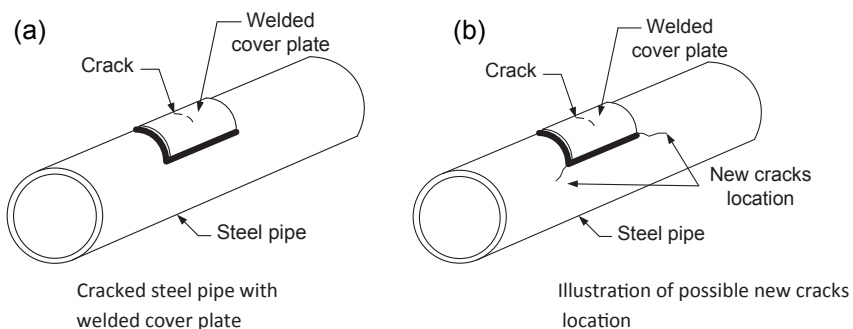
Illustration of cracked steel pipe with welded cover plate.
